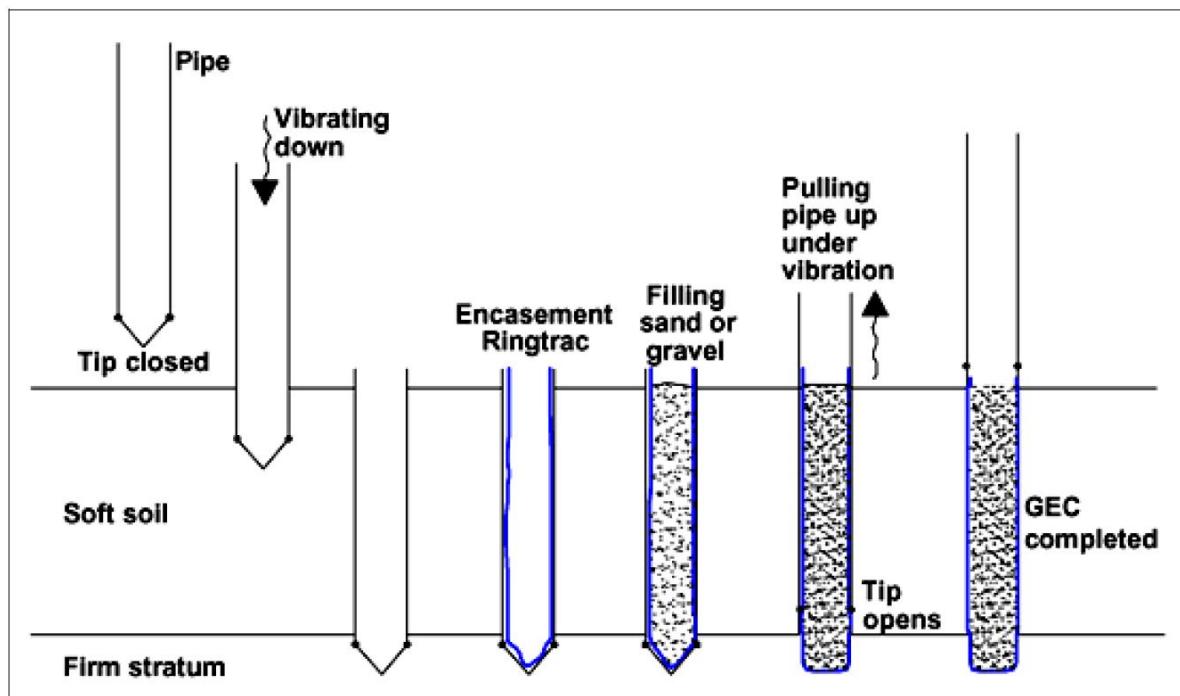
Displacement method of construction. (Alexiew et al. 2011)
